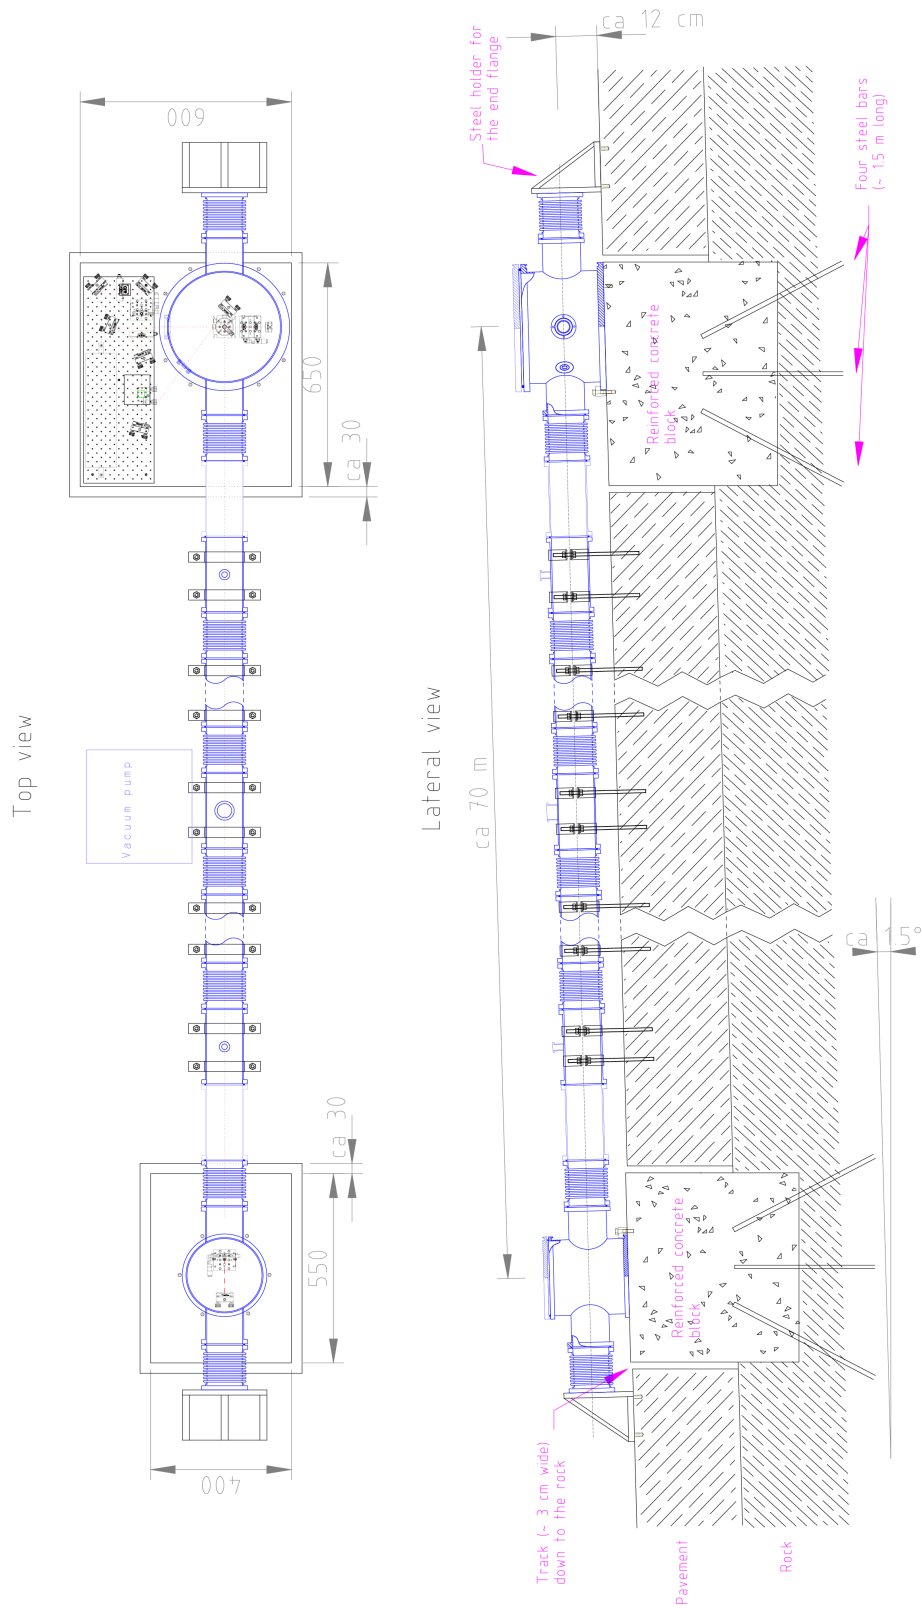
Vacuum line set-up in Bypass 16 (all dimensions in millimeters).
